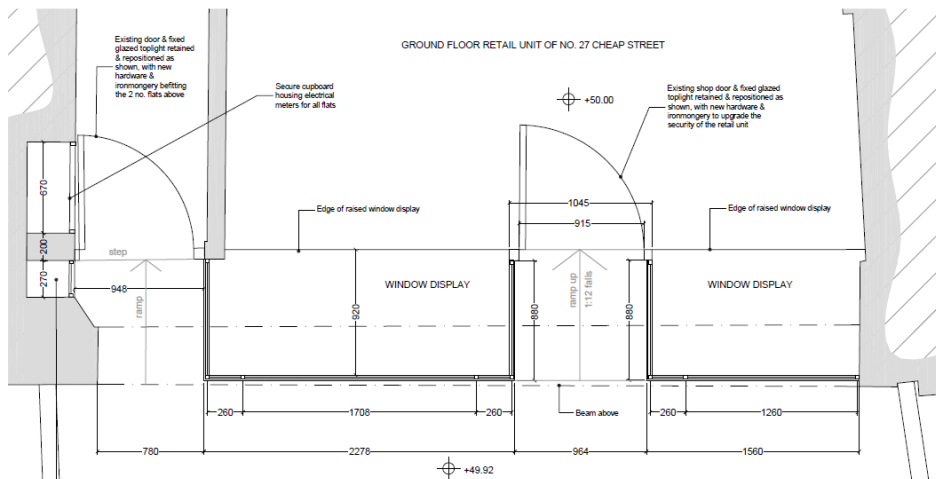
Angel Architecture Ltd drawing No 1922-09 Proposed Ground Floor Plan.
